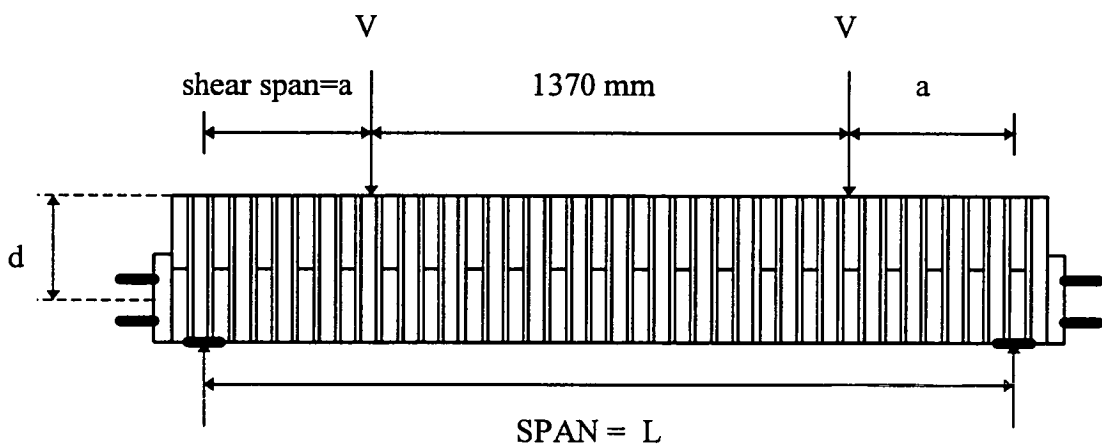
Test set-up for pocket-type reinforced brickwork beam
